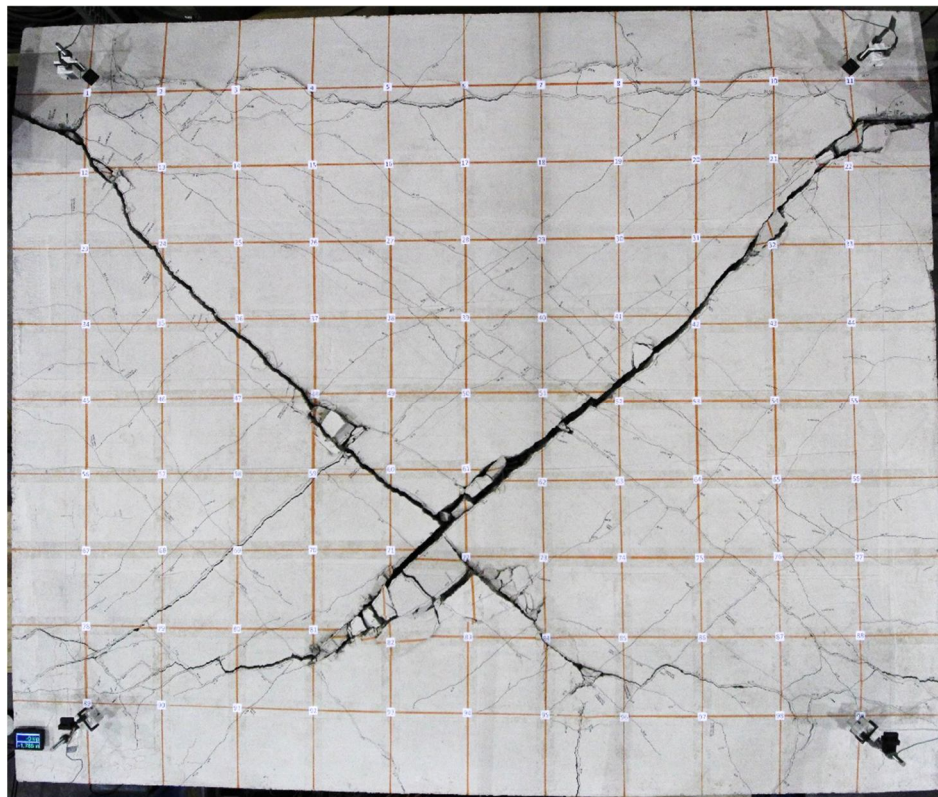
Cracking Pattern of Specimen 3/6.25-4-L-RS-DT: After Testing (Point F in Figure 3-59)
